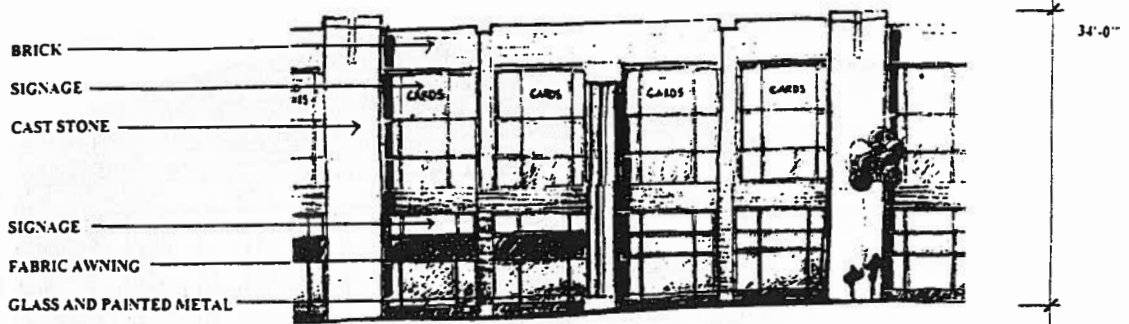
### DETAIL BUILDING ELEVATIONS SUB-AREA B
